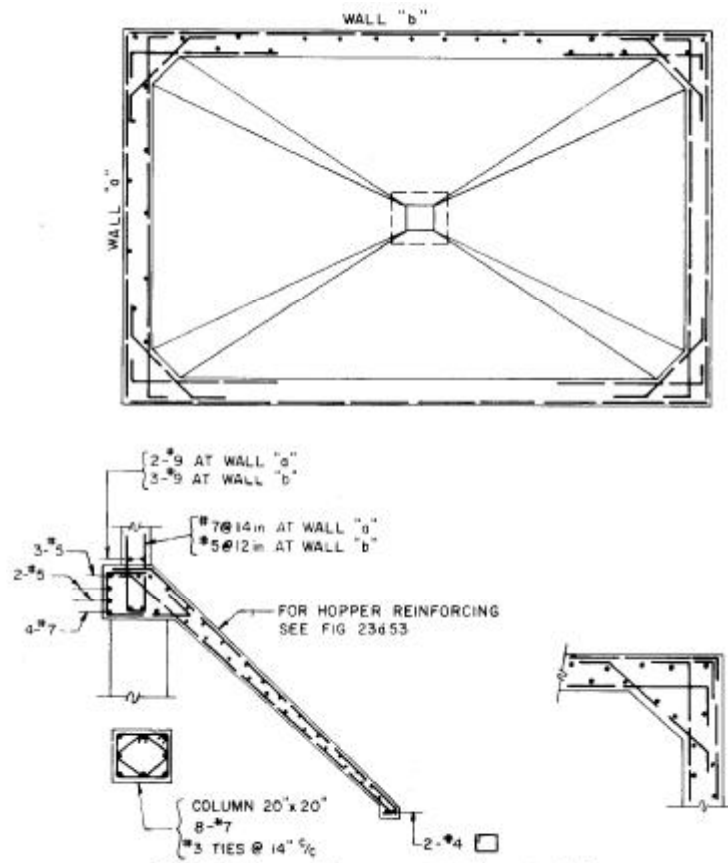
Hopper reinforcement details (Example 16-4).
